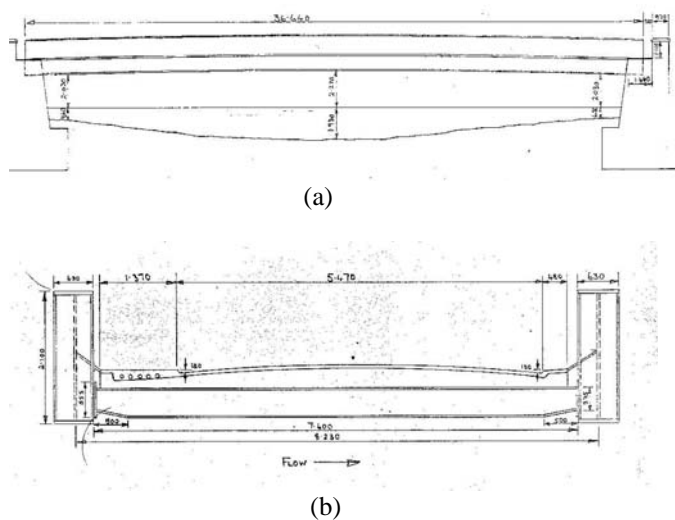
, Steel bridge over the river Exe, (a) Elevation, (b) Section through the deck.
